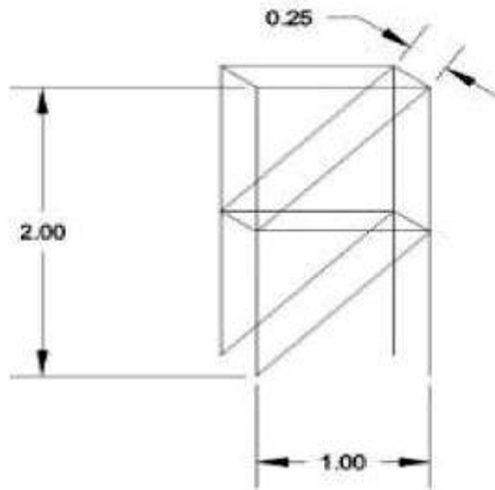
Frame installed with SMA damper as diagonal bracing (unit; m)
